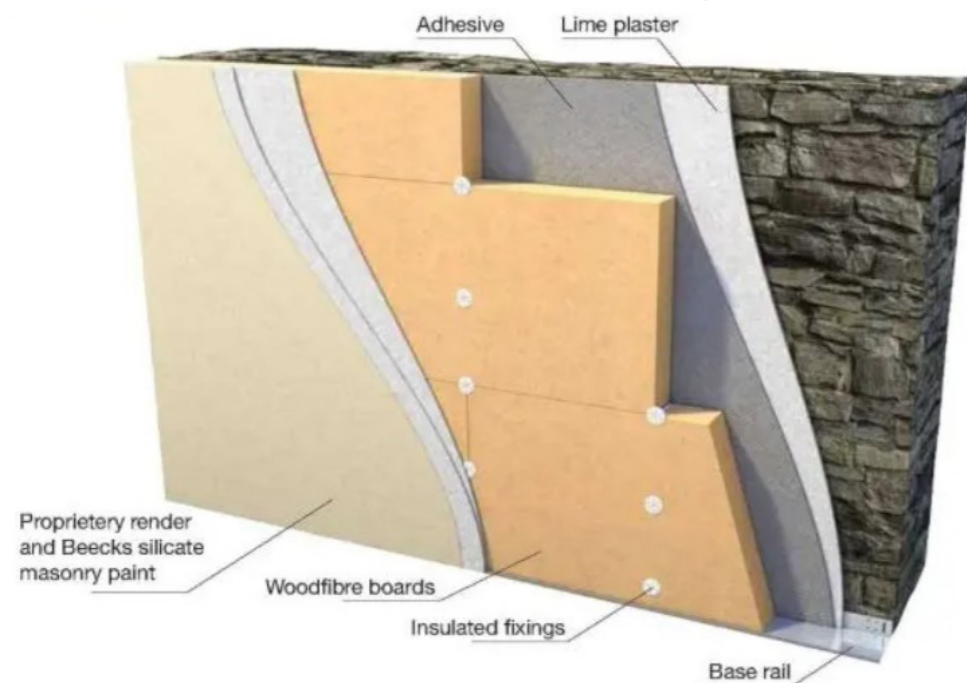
External wall build up sample detail of conservation wood fibre insulation and lime build up to suit listed building structure.
